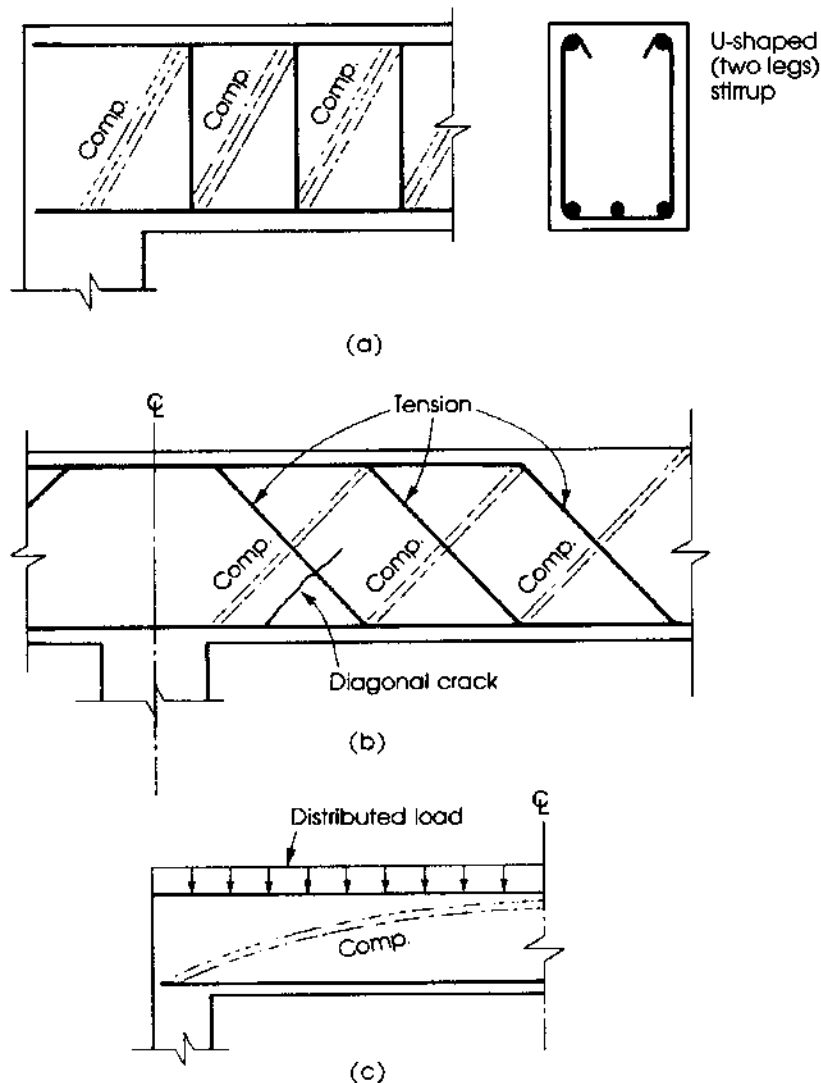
Truss action of web reinforcement with (a) stirrups, (b) bent bars, and (c) tension steel.
